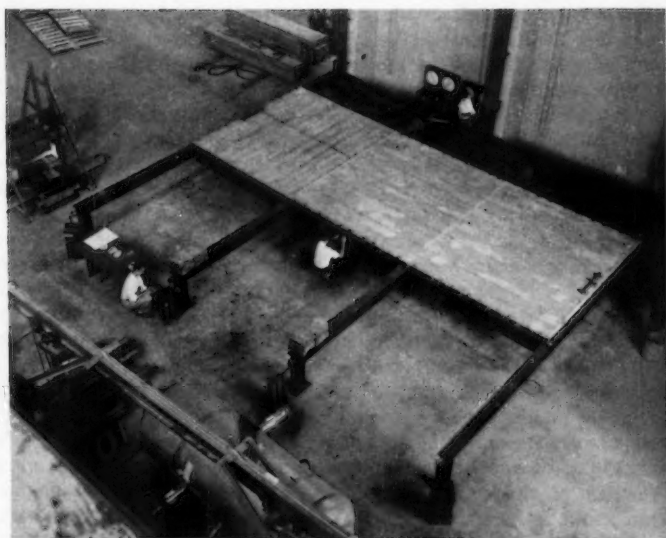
THREE BAY DIAPHRAGM TEST OF TYPE 10 PANELS
